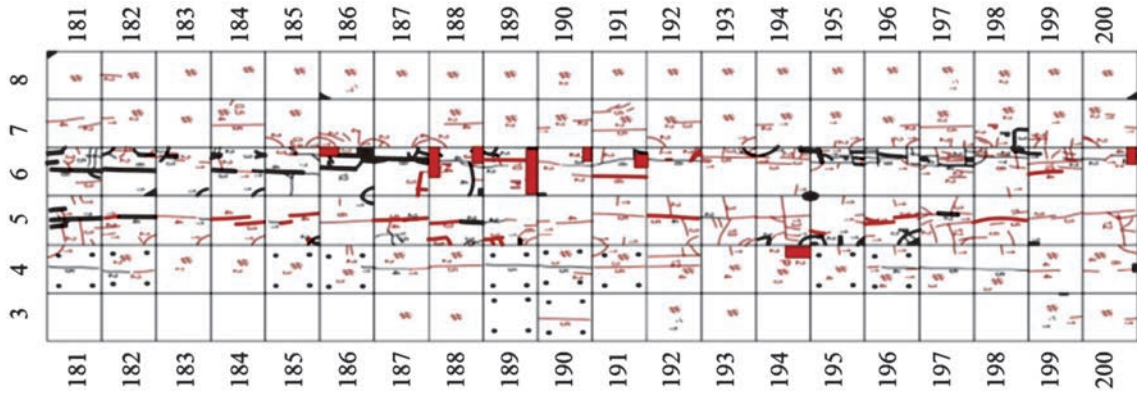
Example record of damage in an airport pavement made from cement concrete
